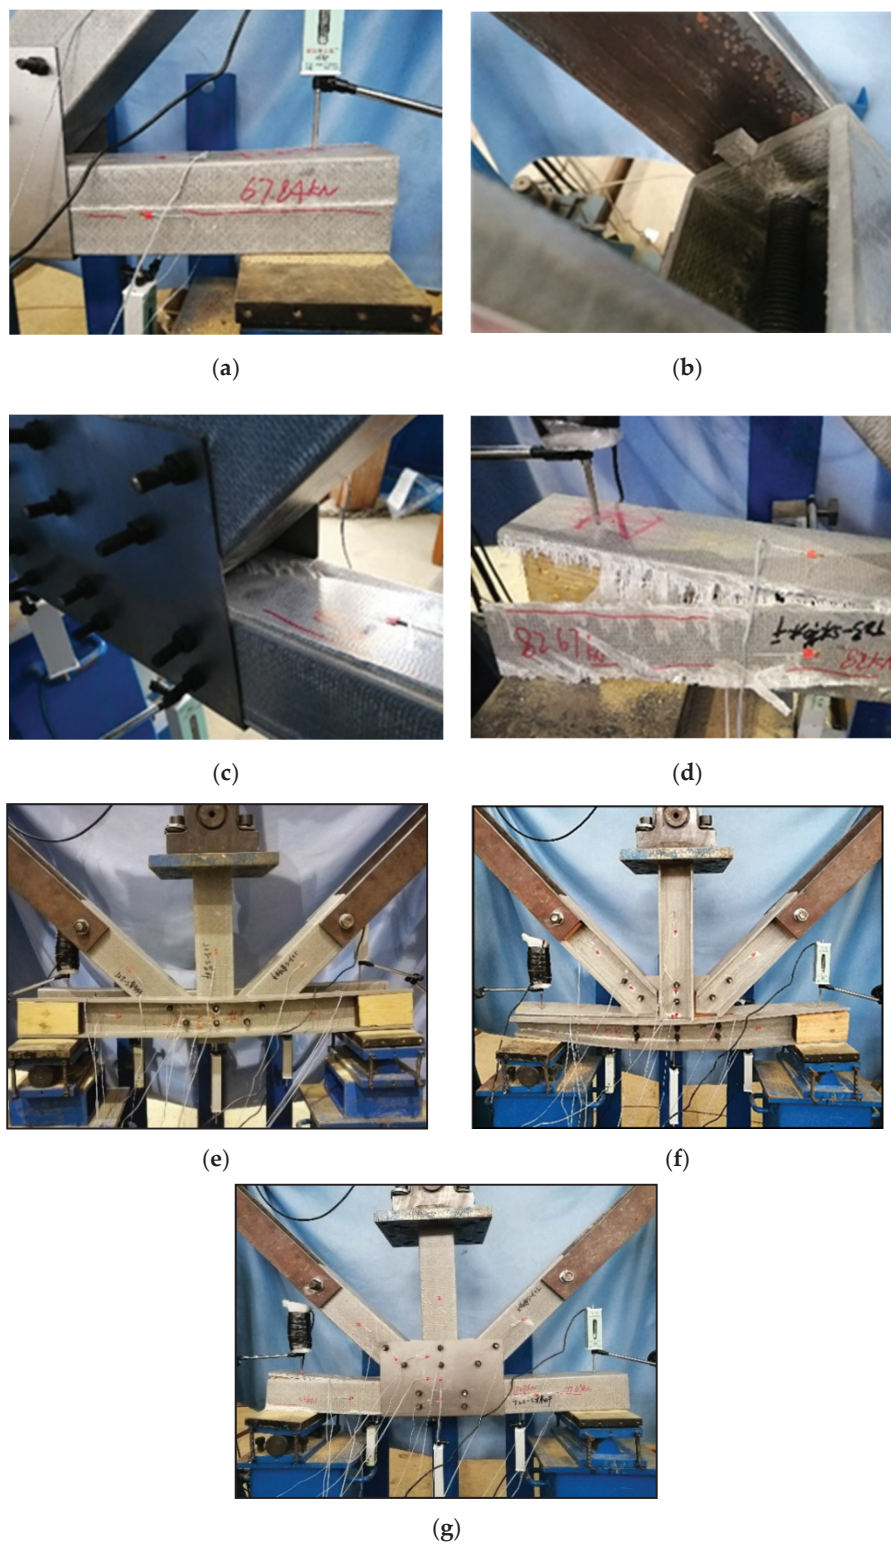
Failure modes of GFRP truss joints: (a) shear-out of webs, (b) shear-out of diagonal chords, (c) crush of top flanges, (d) separation of top flange and webs, (e) failed specimen BJ, (f) failed specimen GP, and (g) failed specimen IGP.
